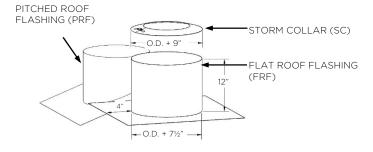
, Flat & Pitched Cone Flashings and Storm Collar
